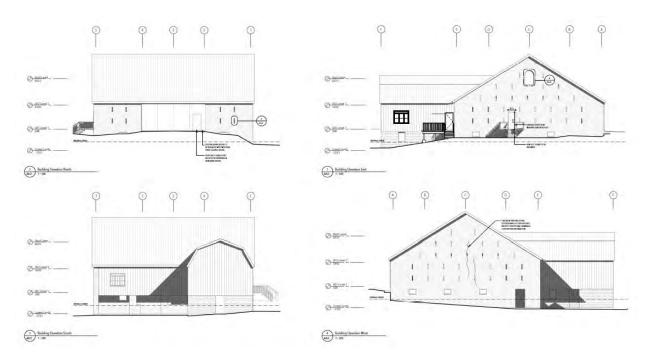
Proposed elevations of slit barn rehabilitation (Source: Fryett Turner Architects Inc.).
